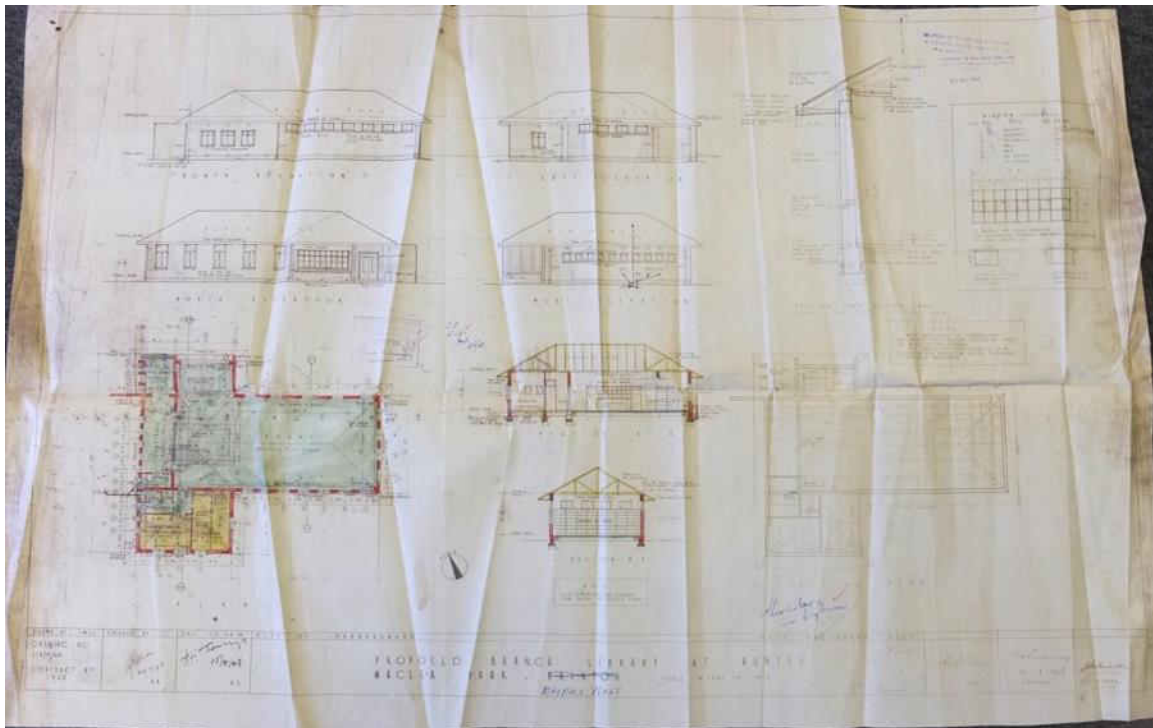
Proposed Branch Library at Hunter Maclea Park, Mayfair West, plan shows floor plan, section and elevations
